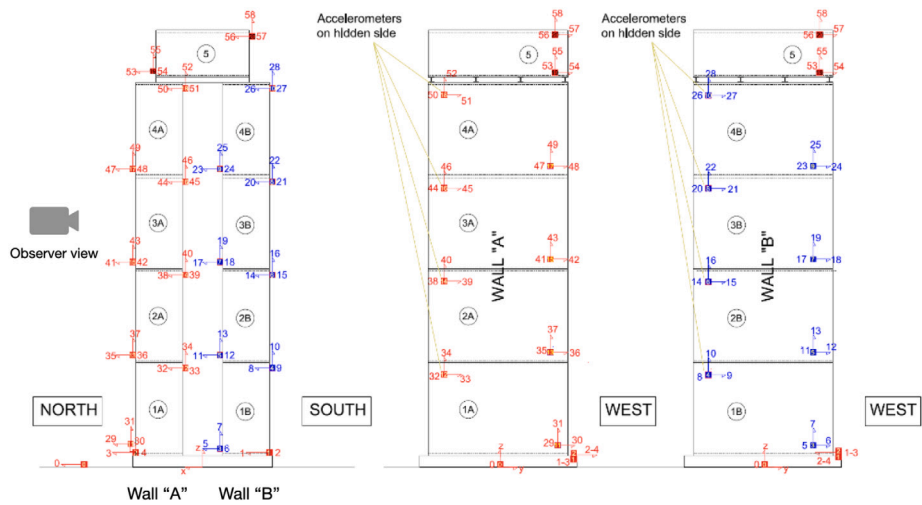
Specimen of Configuration 4: layout of the accelerometers (left) with Wall A (middle) and Wall B (right) from the observer view respectively.
